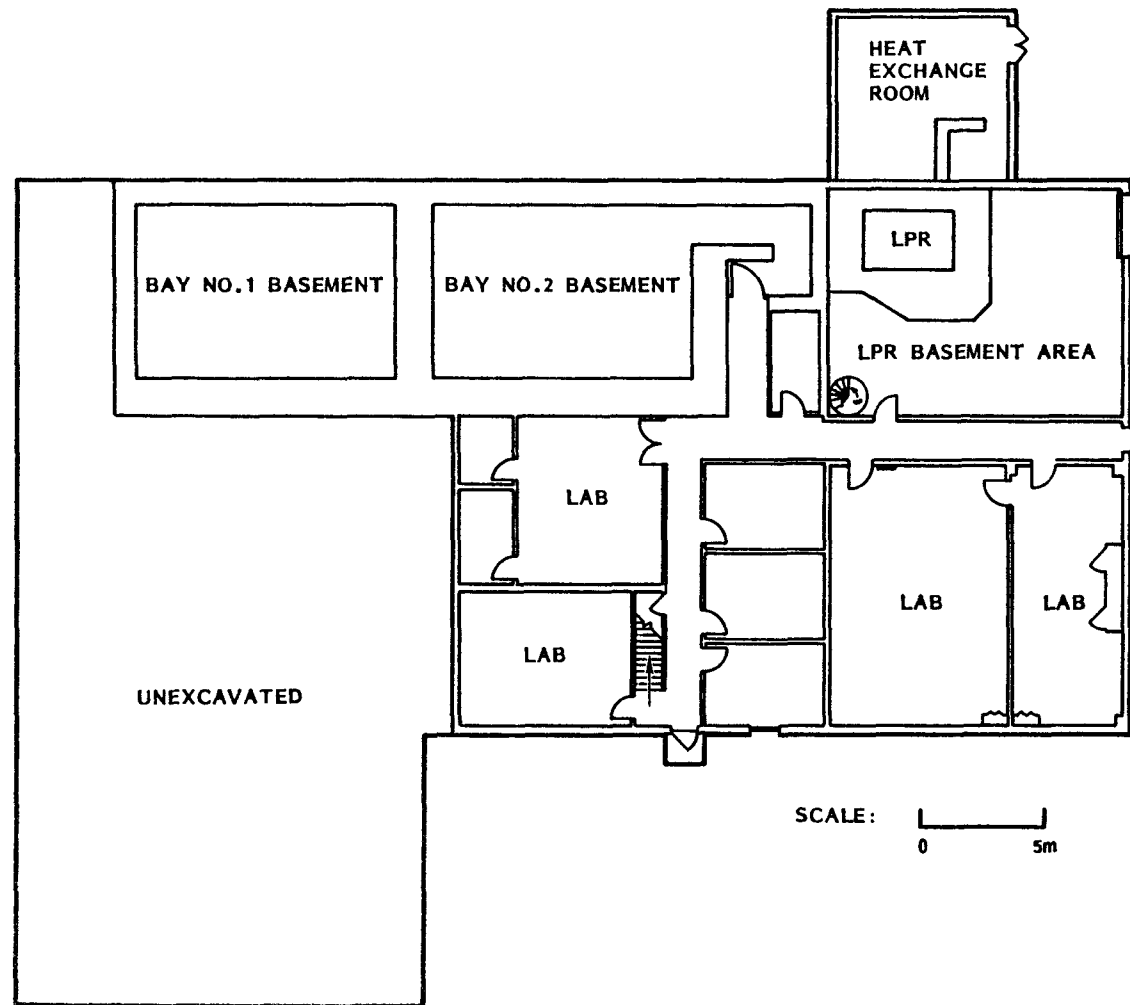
Building "A" (LPR Building) - Basement Floor Level
